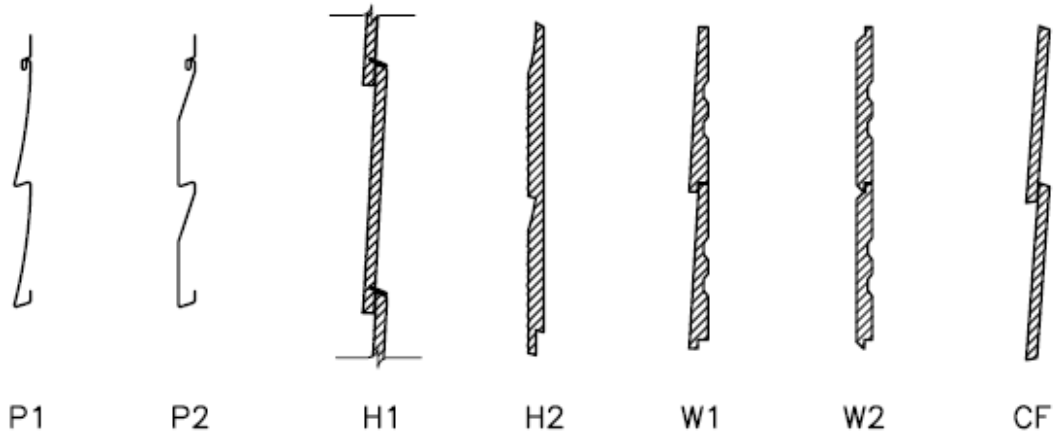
Cross section of Vinyl Siding Profiles, Hardboard Siding and Wood Siding
